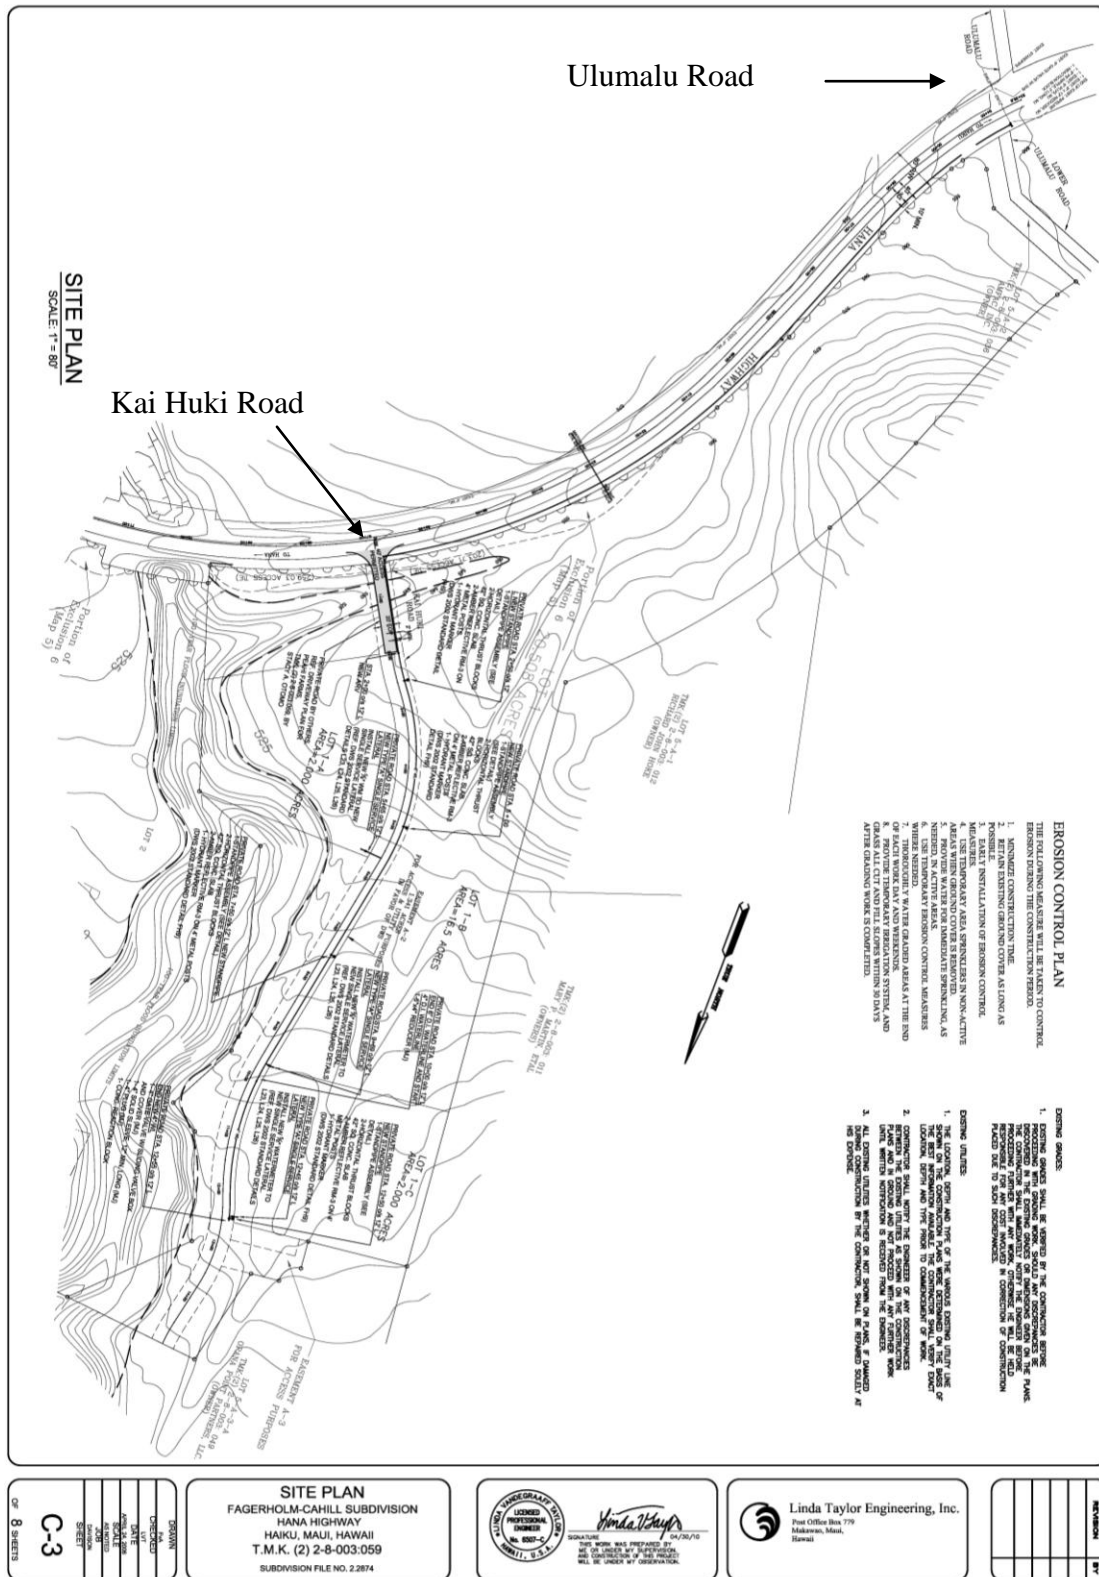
Site Plan, not to scale, refer to attached full size plans for accurate scale.
